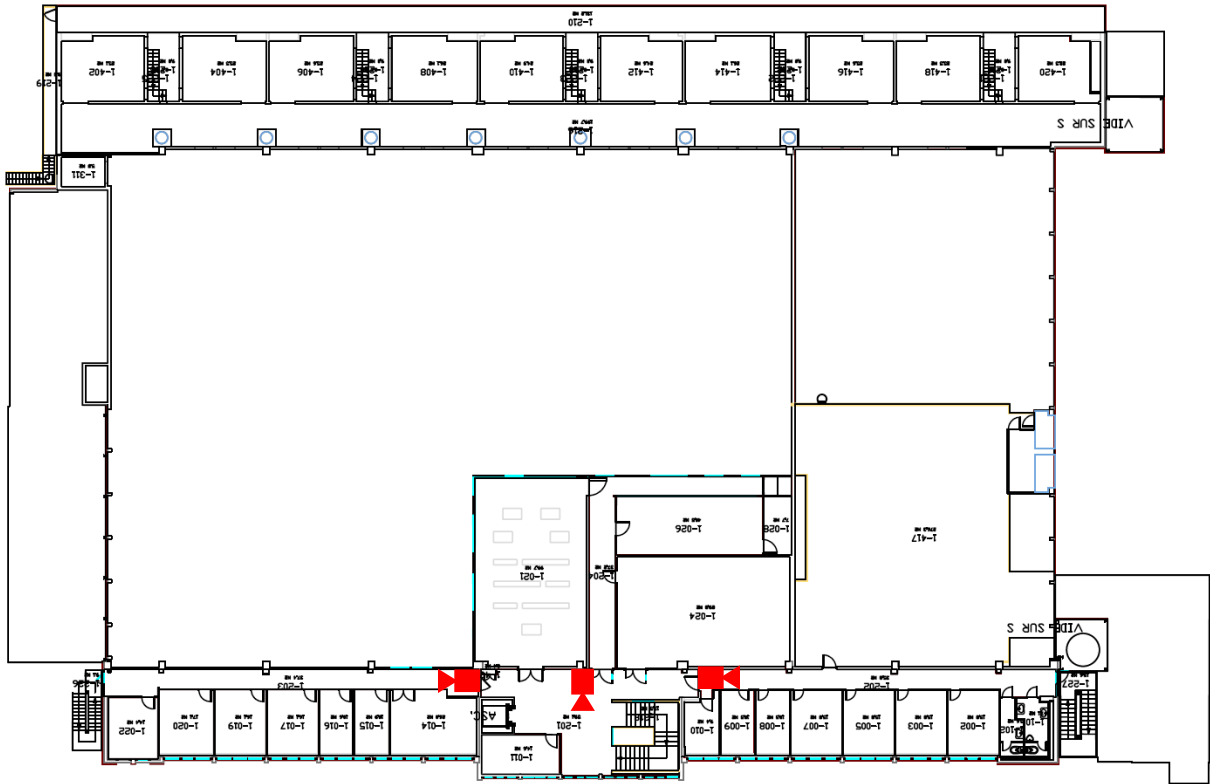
floor R+1 layout as well as the locations and orientations of cameras within this floor – building 2
